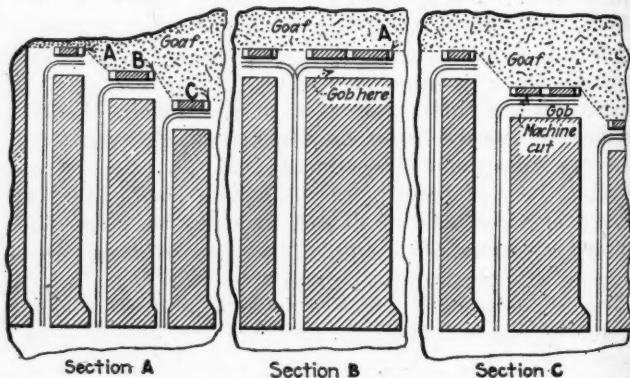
THREE PILLAR METHODS WITH ELKHORN PLAN
